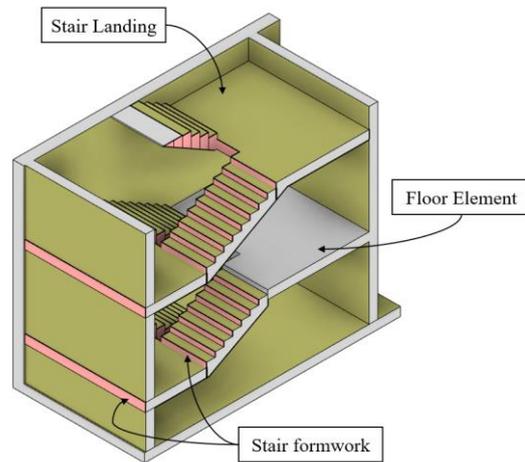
Stair landing modeled with floor element and stair formwork view
